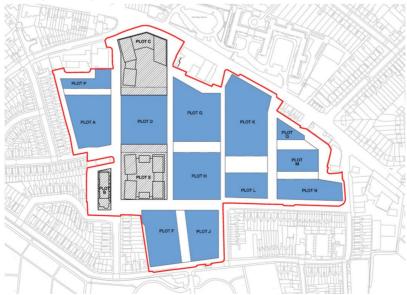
Proposed Masterplan Layout (Patel Taylor, October 2020)
